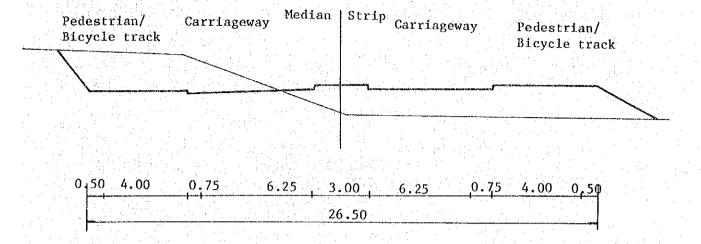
Typical Roadway Cross Section (unit:meter)
